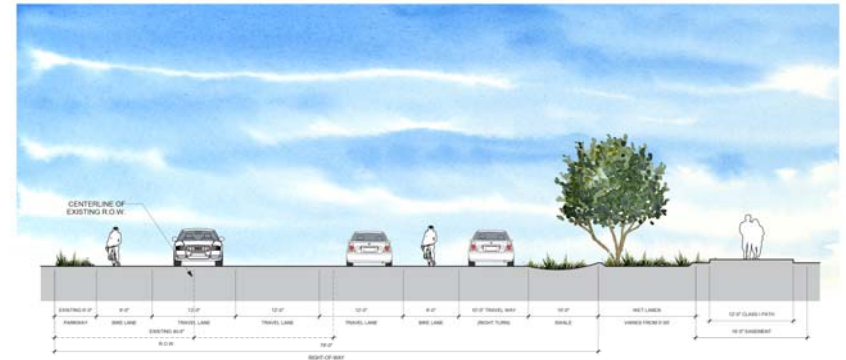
Arterial – Typical Buckley Road Cross-section in Undeveloped Areas.
